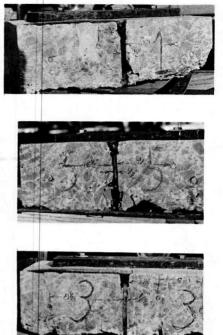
Expansion joint filler originally 3/4 in. non-extruding fiber filler. It now measures 1/2 in.
